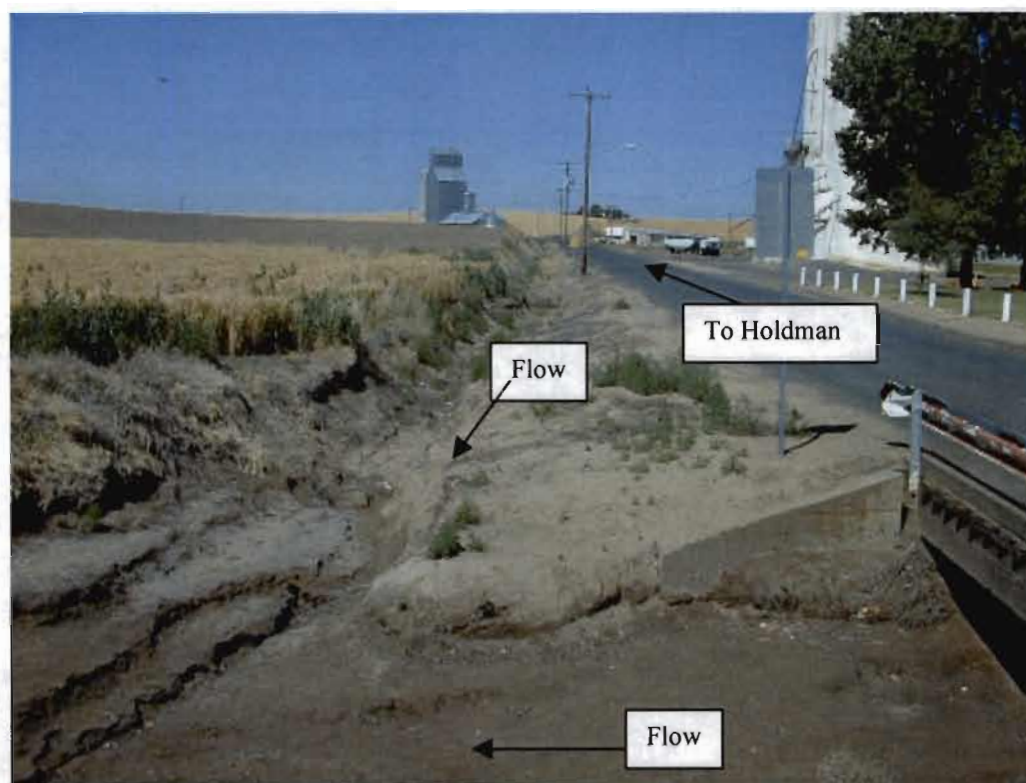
View looks west at Southwest Drainage at confluence with Greasewood Creek.
